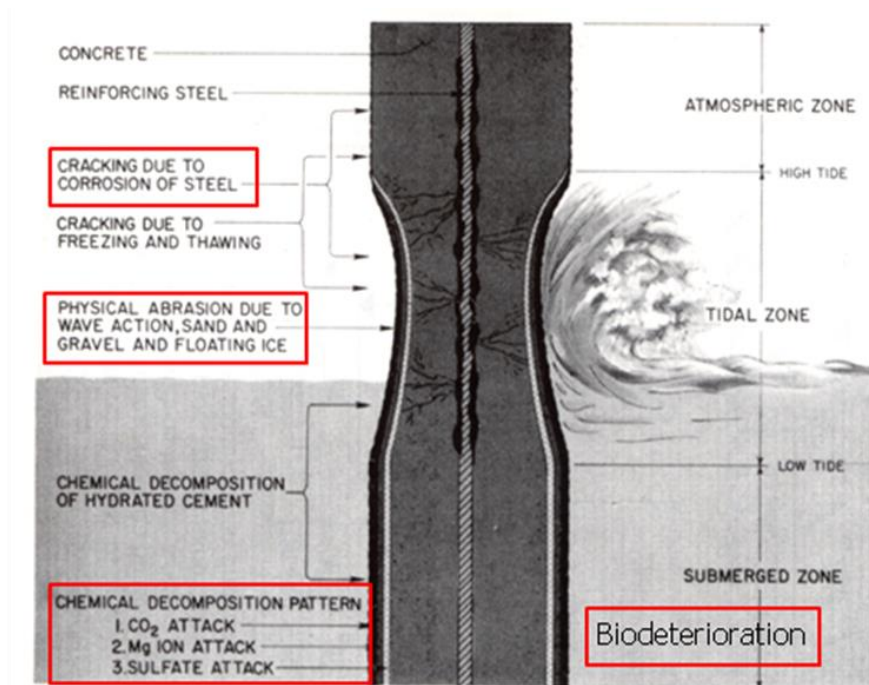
Typical degradation mechanisms in coastal concrete piling (Mehta, 1991)
